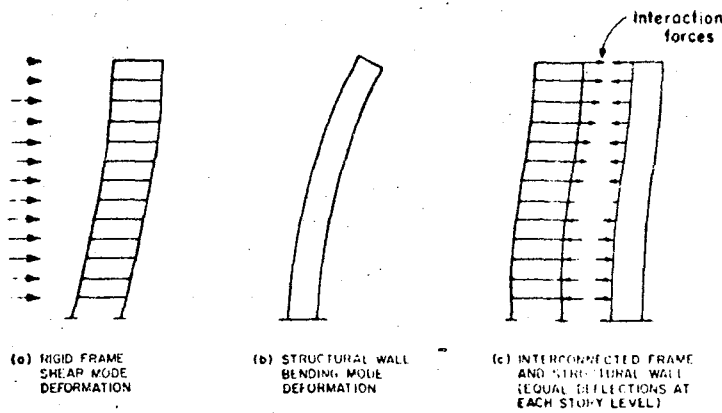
Structural Wall-Frame Interaction Under Lateral Loading
